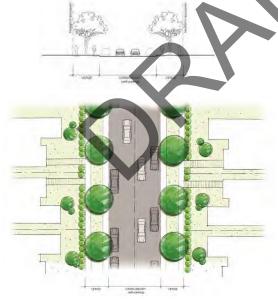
Indicative Layout of a Two Lane Sub-Arterial Road
